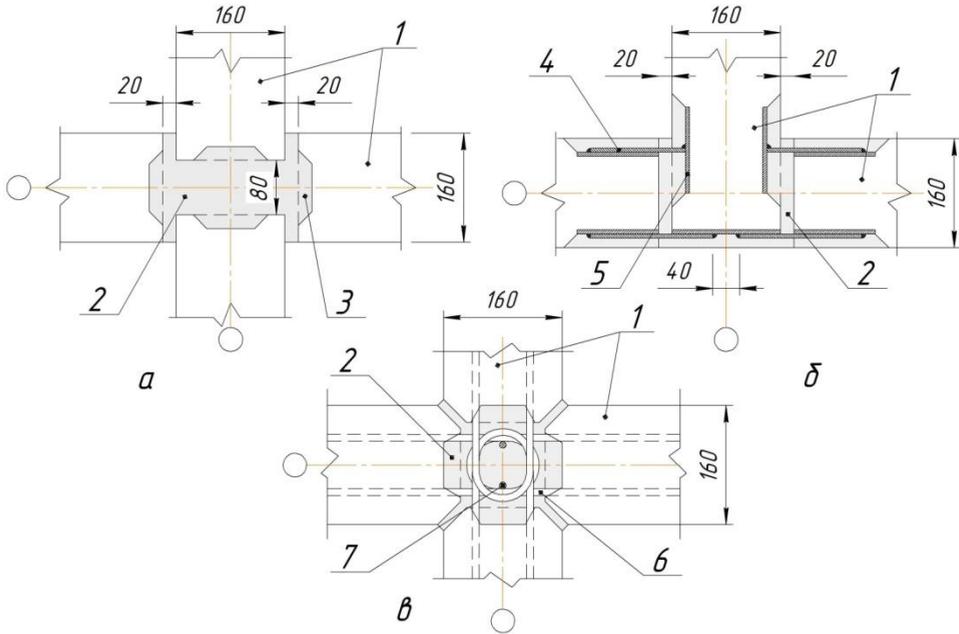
Keyed connection of wall panels (a), connection on the embedded parts (b), monolithic connection of wall panels (b): 1-wall panel, 2 - filling with a mortar, 3-key, 4-connecting plate, 5-embedded part detail, 6- free length of reinforcement bars, 7-vertical free length of reinforcement bars
